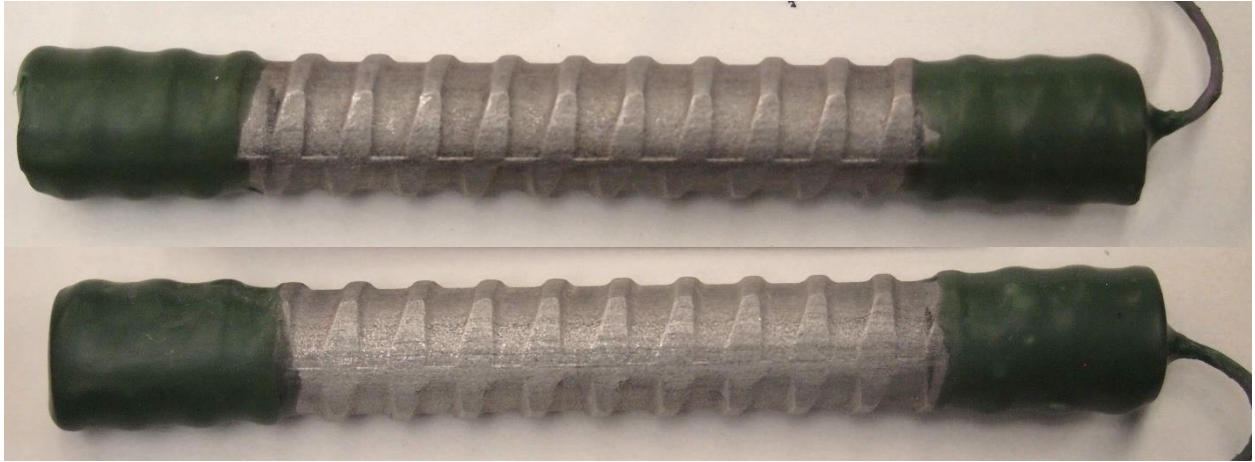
Specimen PKSBT-05 before testing (top) and after testing (bottom)
